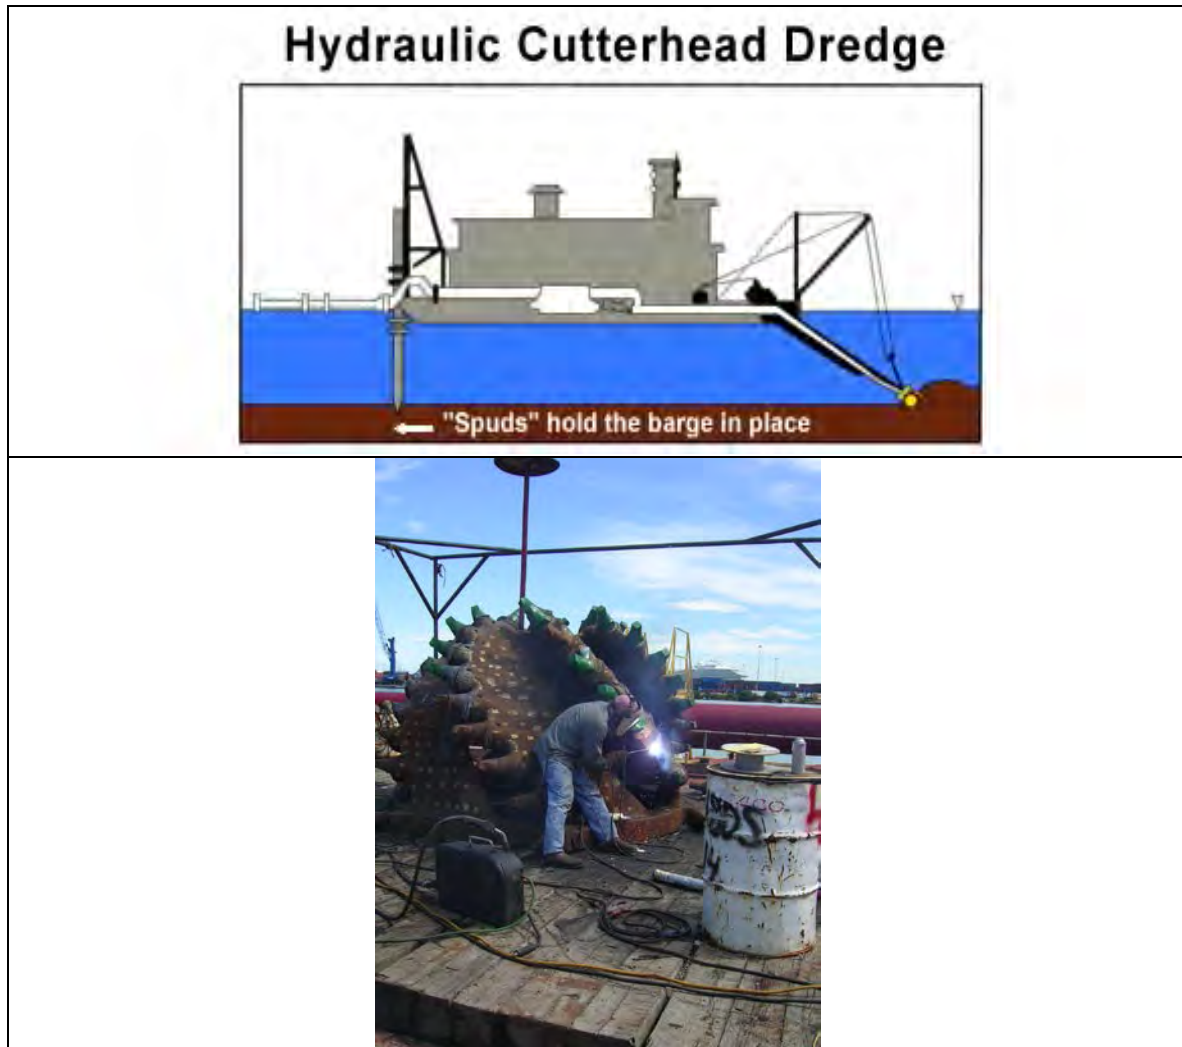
Cutterhead pipeline dredge schematic and representative close-up photographs. (Video of cutterhead dredge: <http://el.erdc.usace.army.mil/dots/doer/anima/cutterside.avi>)
